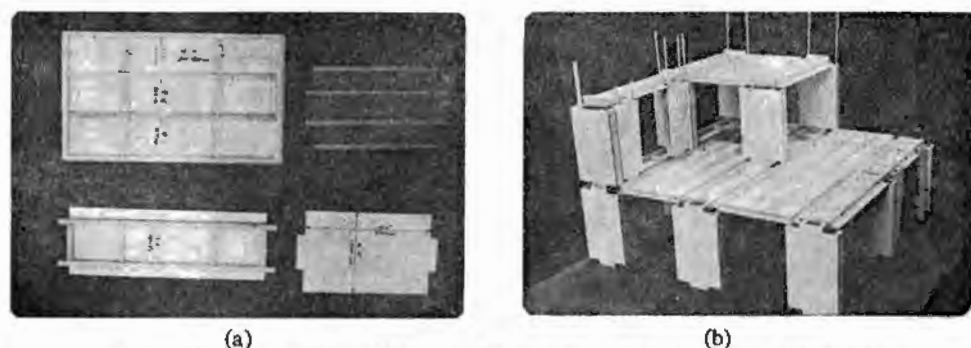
Housing project model. (a) Component units. (b) Sample assembly
